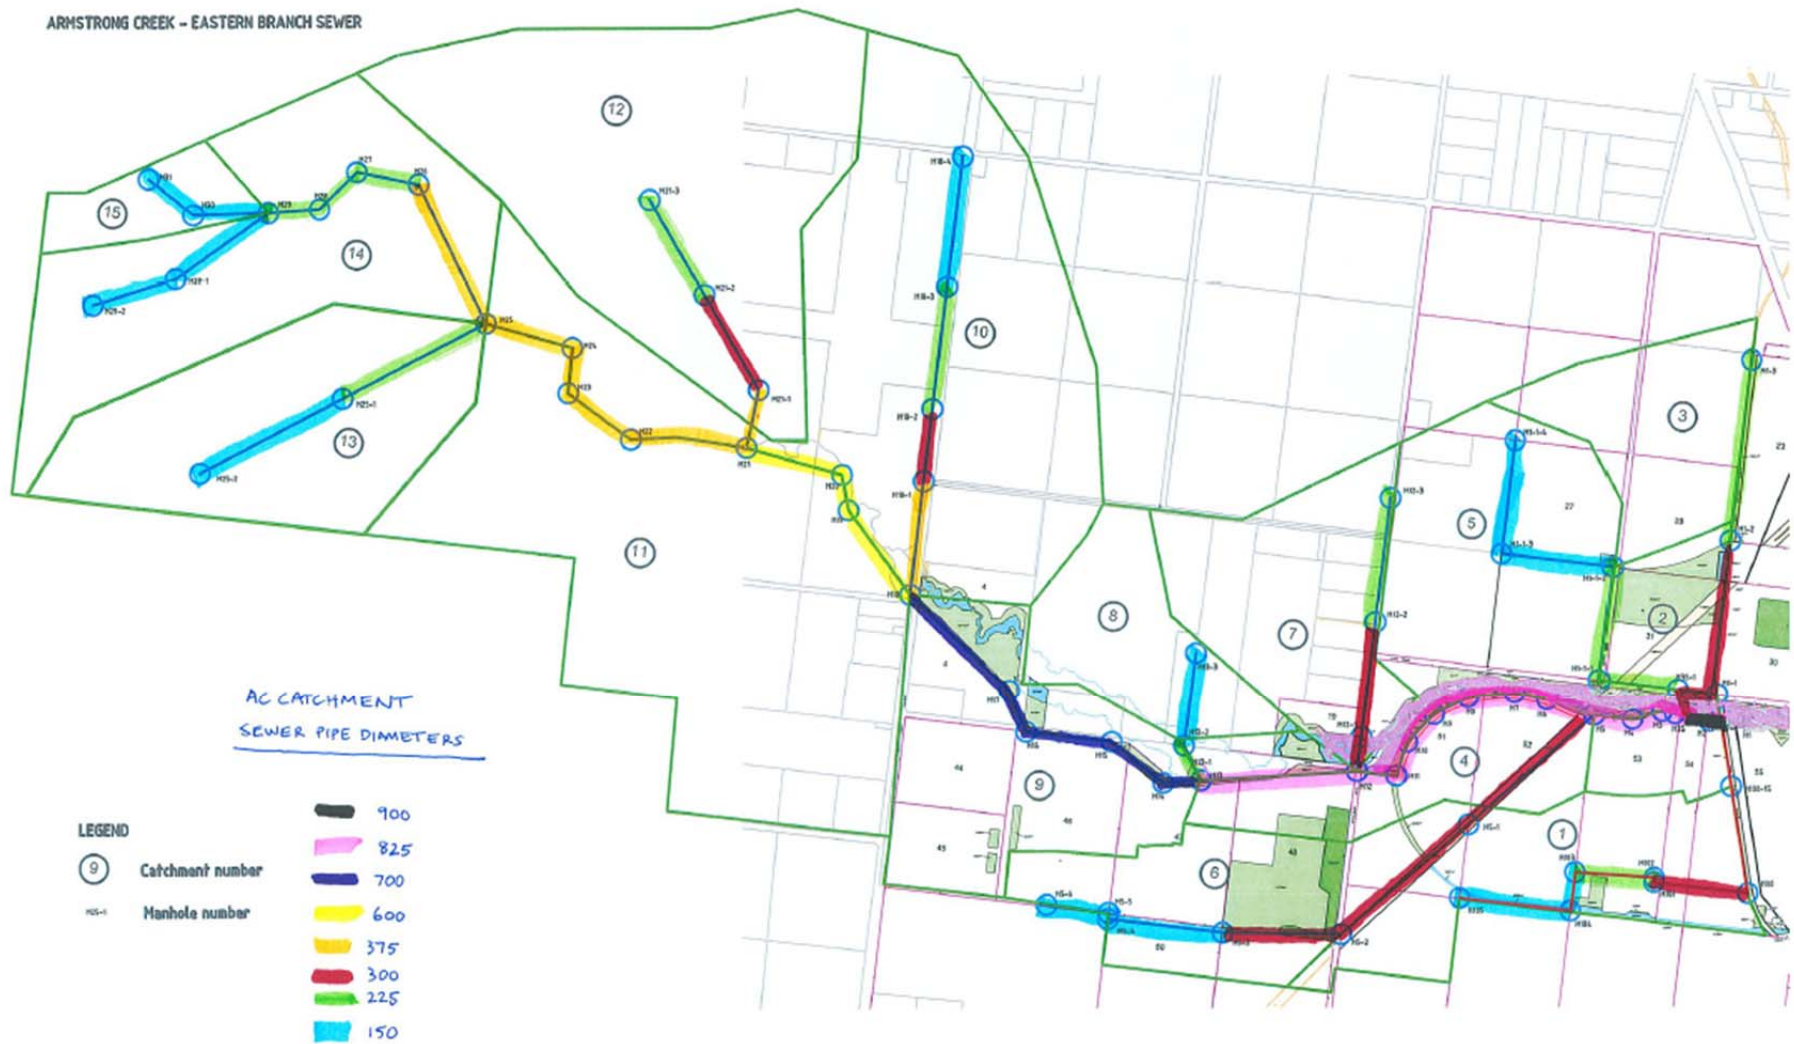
Armstrong Creek Trunk Sewerage Infrastructure Plan
